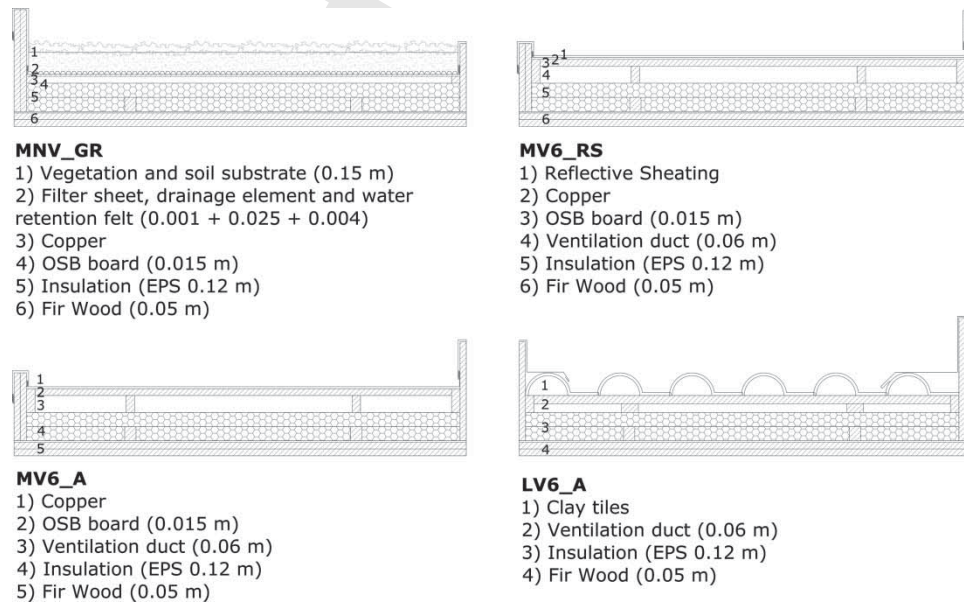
Stratigraphies of the four roofs installed in the experimental building: two ventilated clay tiles and copper roofs (LV6_A, MV6_A), a green roof (MNV_GR) and a roof with a reflective covering (MV6_RS).
